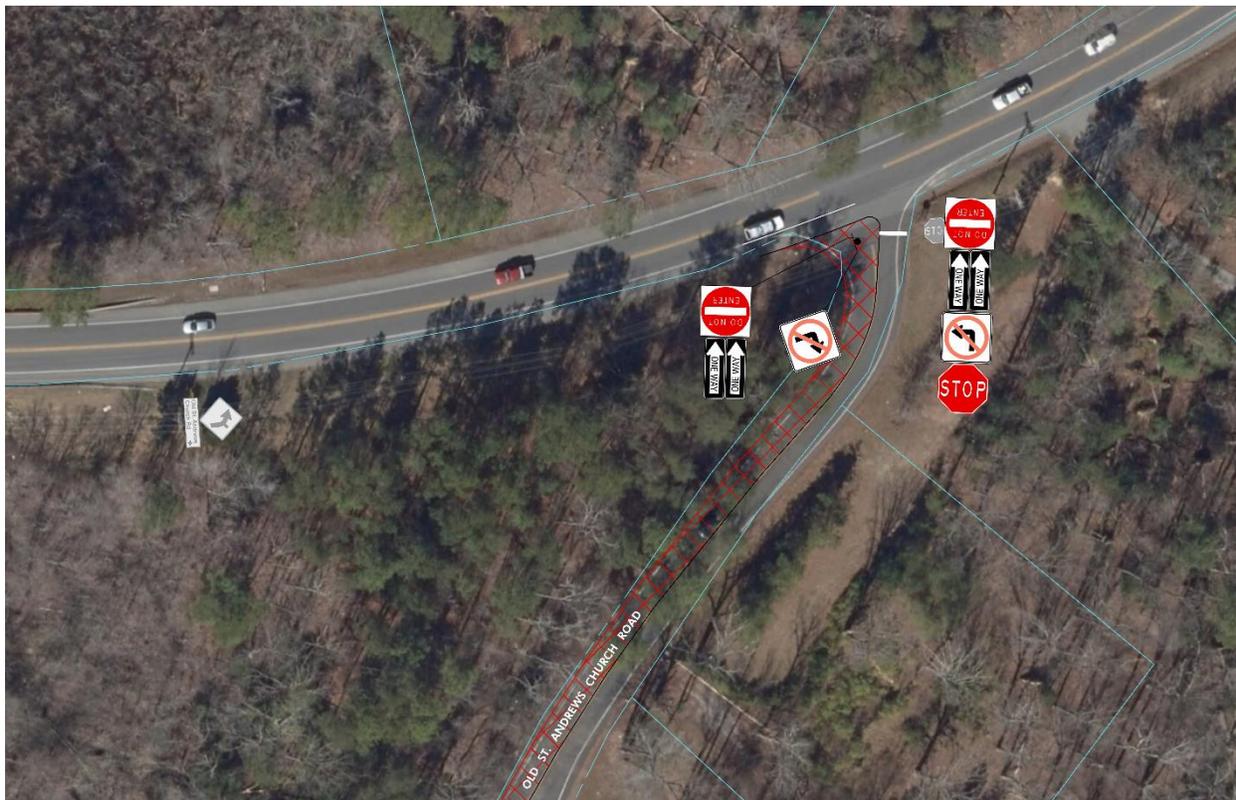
Proposed Improvements at Old St. Andrews Church Road (east leg)
